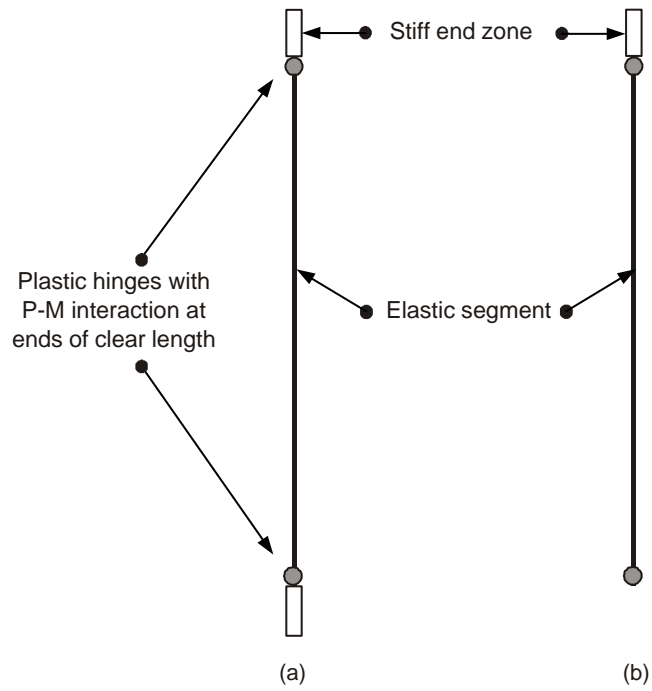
Column component model: (a) General floor columns; (b) First floor columns
